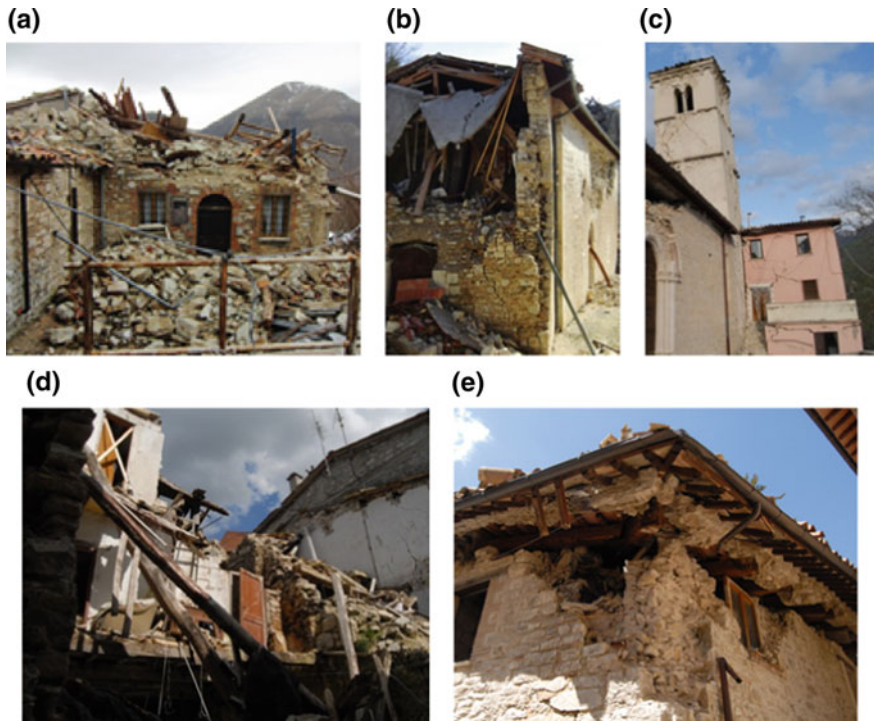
Unfavorable behavior of masonry structures under seismic actions. Out-of-plane collapse (modes 0 and 1) due to poor-quality construction: a collapse due to poor-quality masonry (Gualdo, near Castelsantangelo sul Nera); b local collapse due to lack of connections in multi-layer masonry at corners (Castelsantangelo sul Nera); c pounding due to irregular interaction between house and contiguous bell-tower (Castelsantangelo sul Nera); d facade overturning in terraced house with original timber floors parallel to façade (Castelsantangelo sul Nera); e effect of thrusting roof resting on two-leaf masonry wall (Castelsantangelo sul Nera)
